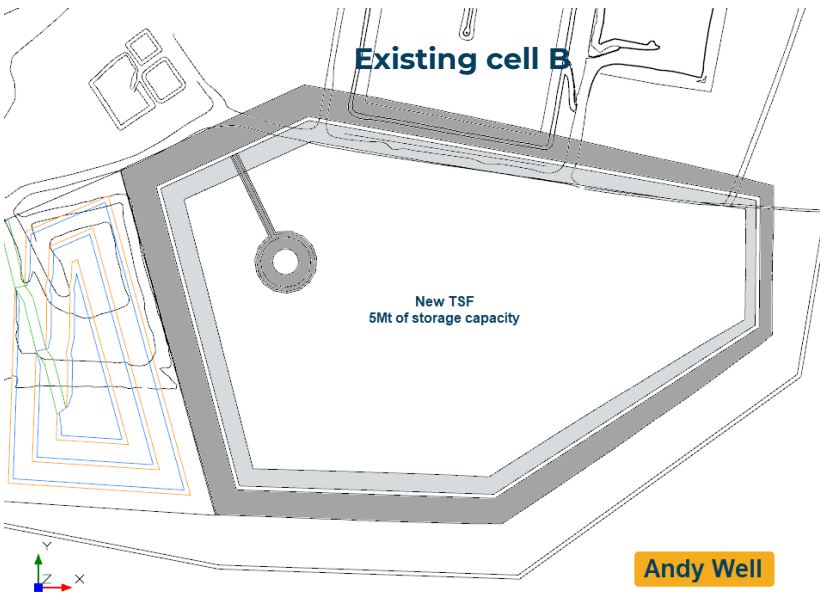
New integrated waste rock TSF cell design to the south of the existing TSF (47Ha and 4,000,000m³ of tails capacity).
